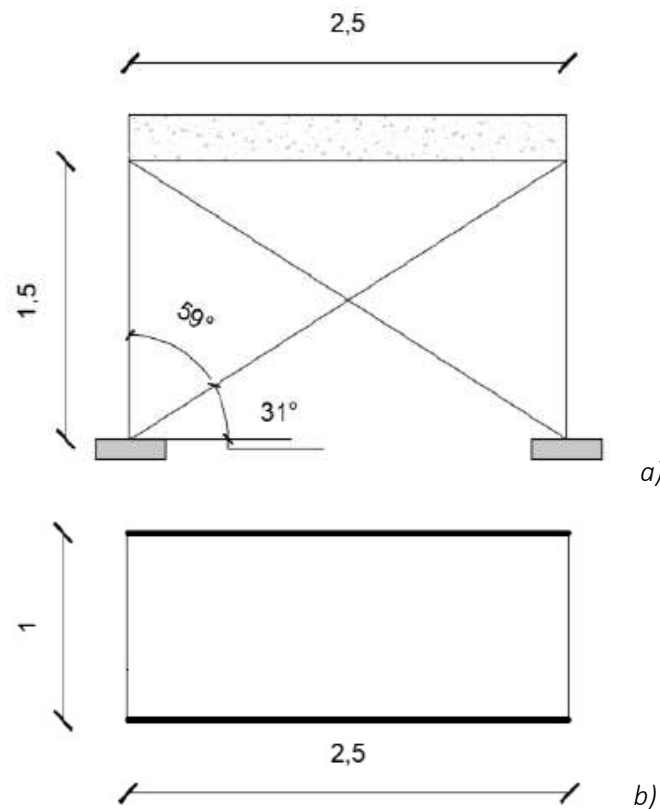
Structural scheme of the tested CBF. (a) Longitudinal view of the elevation and (b) plan (dimensions in meters)
